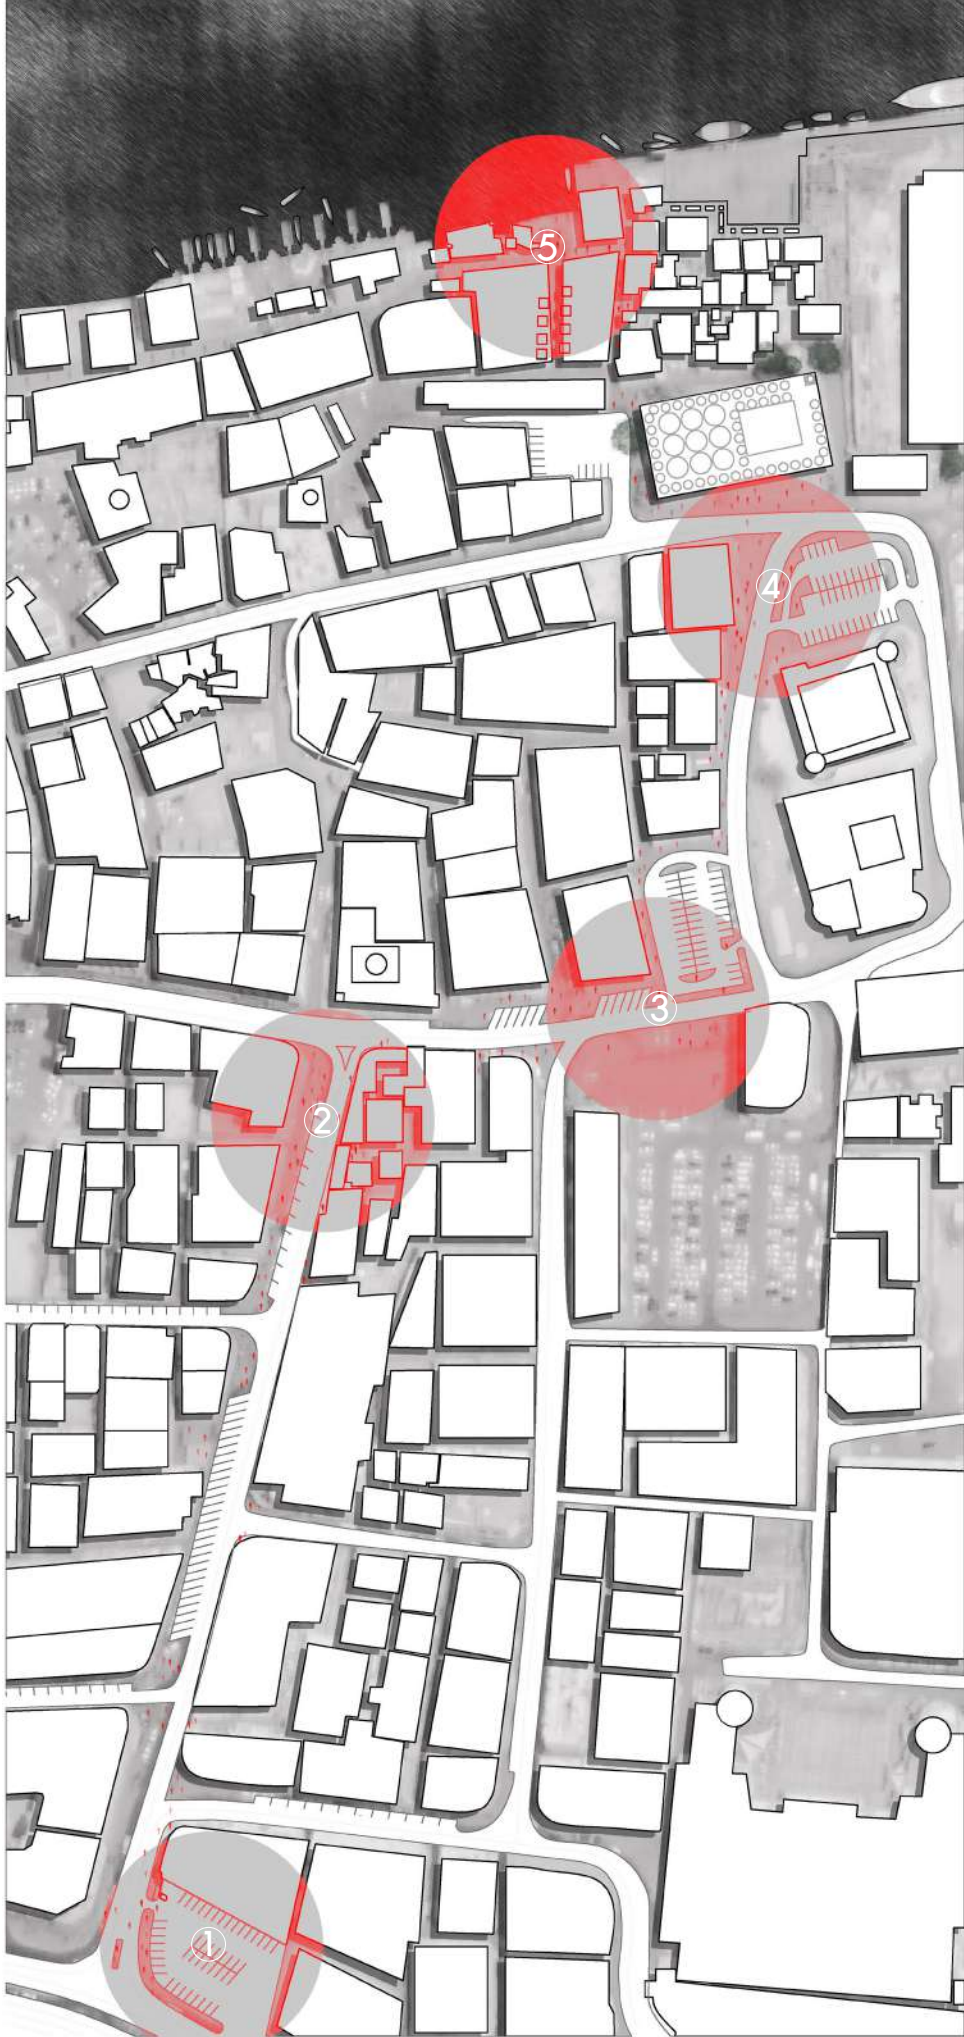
Site Plan: Meena Bazaar, Bur Dubai
